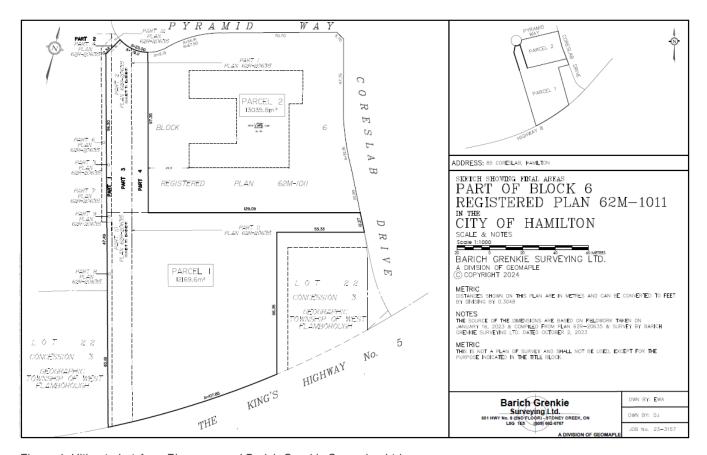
Ultimate Lot Area Plan prepared Barich Grenkie Surveying Ltd.
